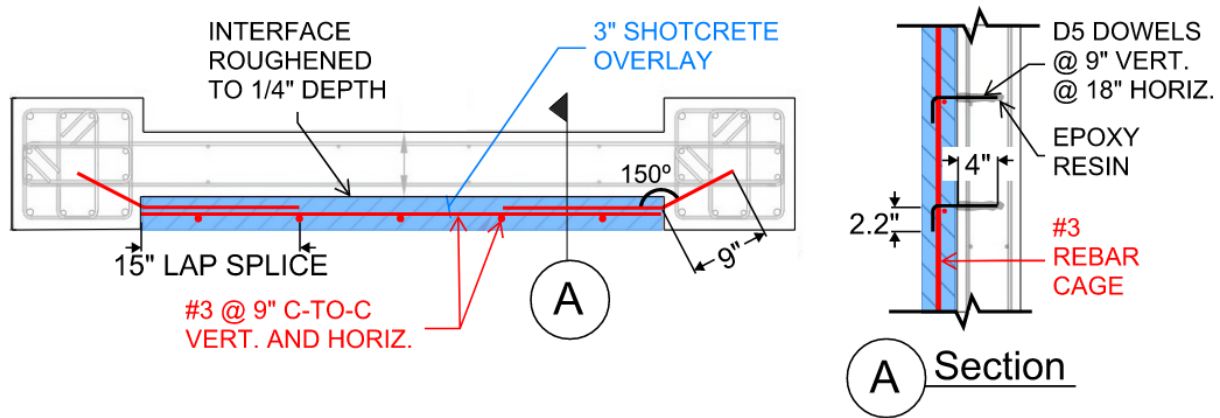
S1CW Overlay Reinforcement and Embedment Details
